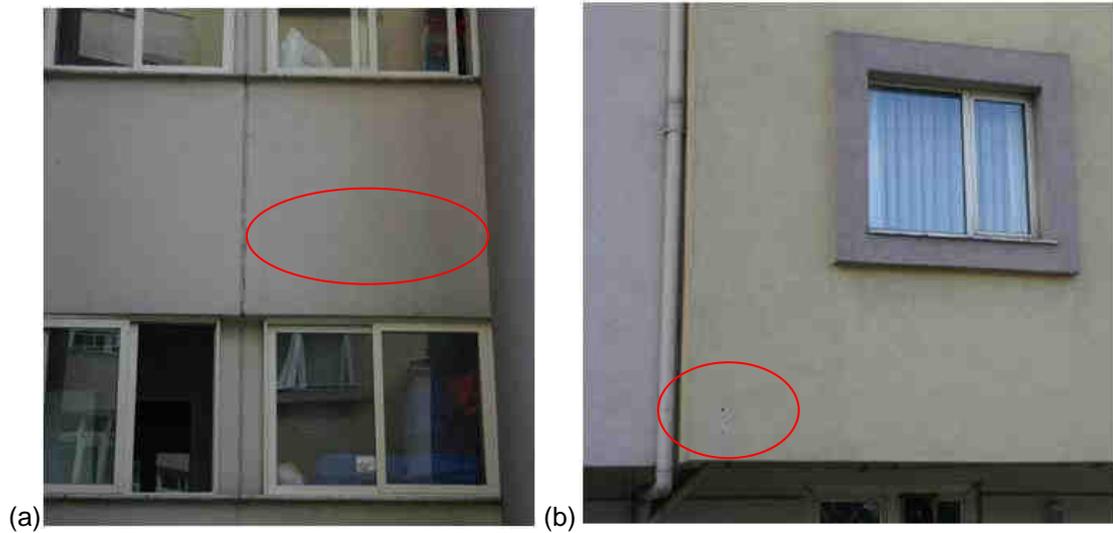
Examples from BS-E: (a) crack at floor beam-infill wall interface, (b) drill hole that has not been repaired after the removal of a security camera
